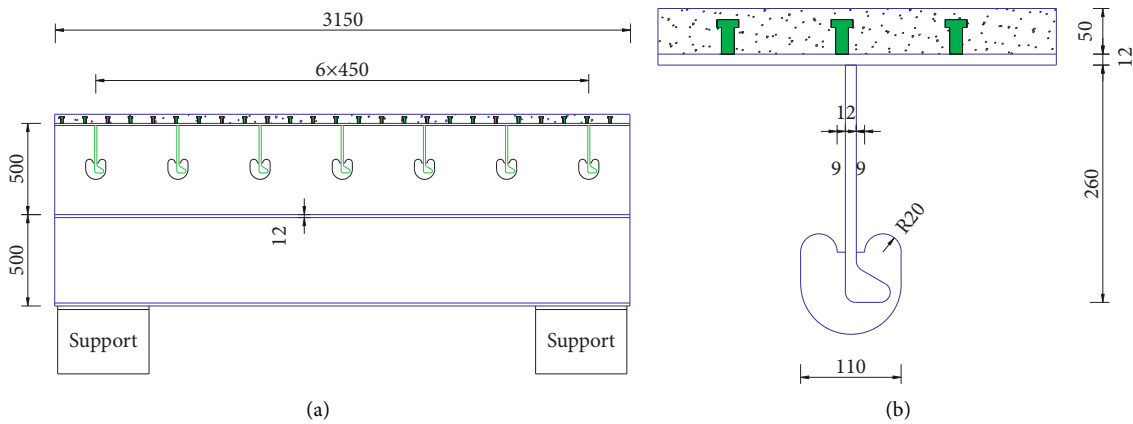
Full-scale specimen: (a) elevation view; (b) cross section (unit: mm).
